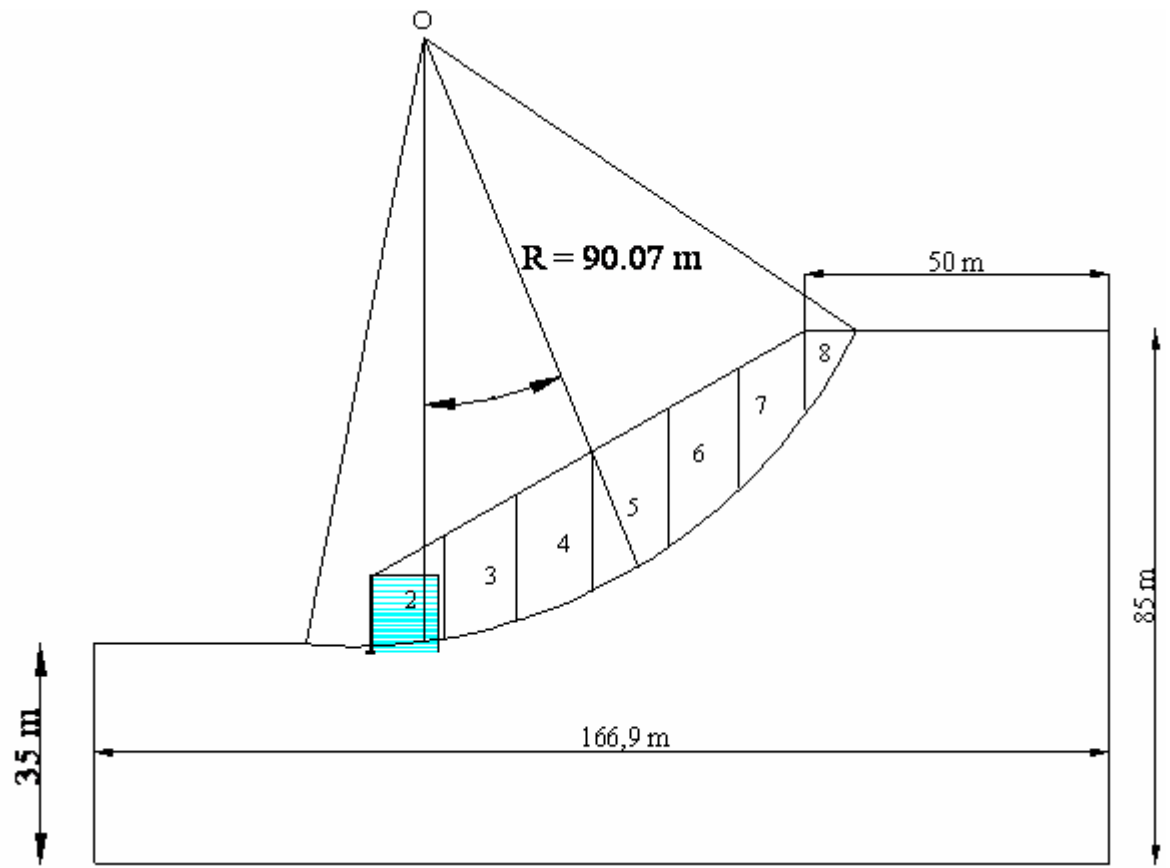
Final position of reinforced earth retaining wall as to slice method
